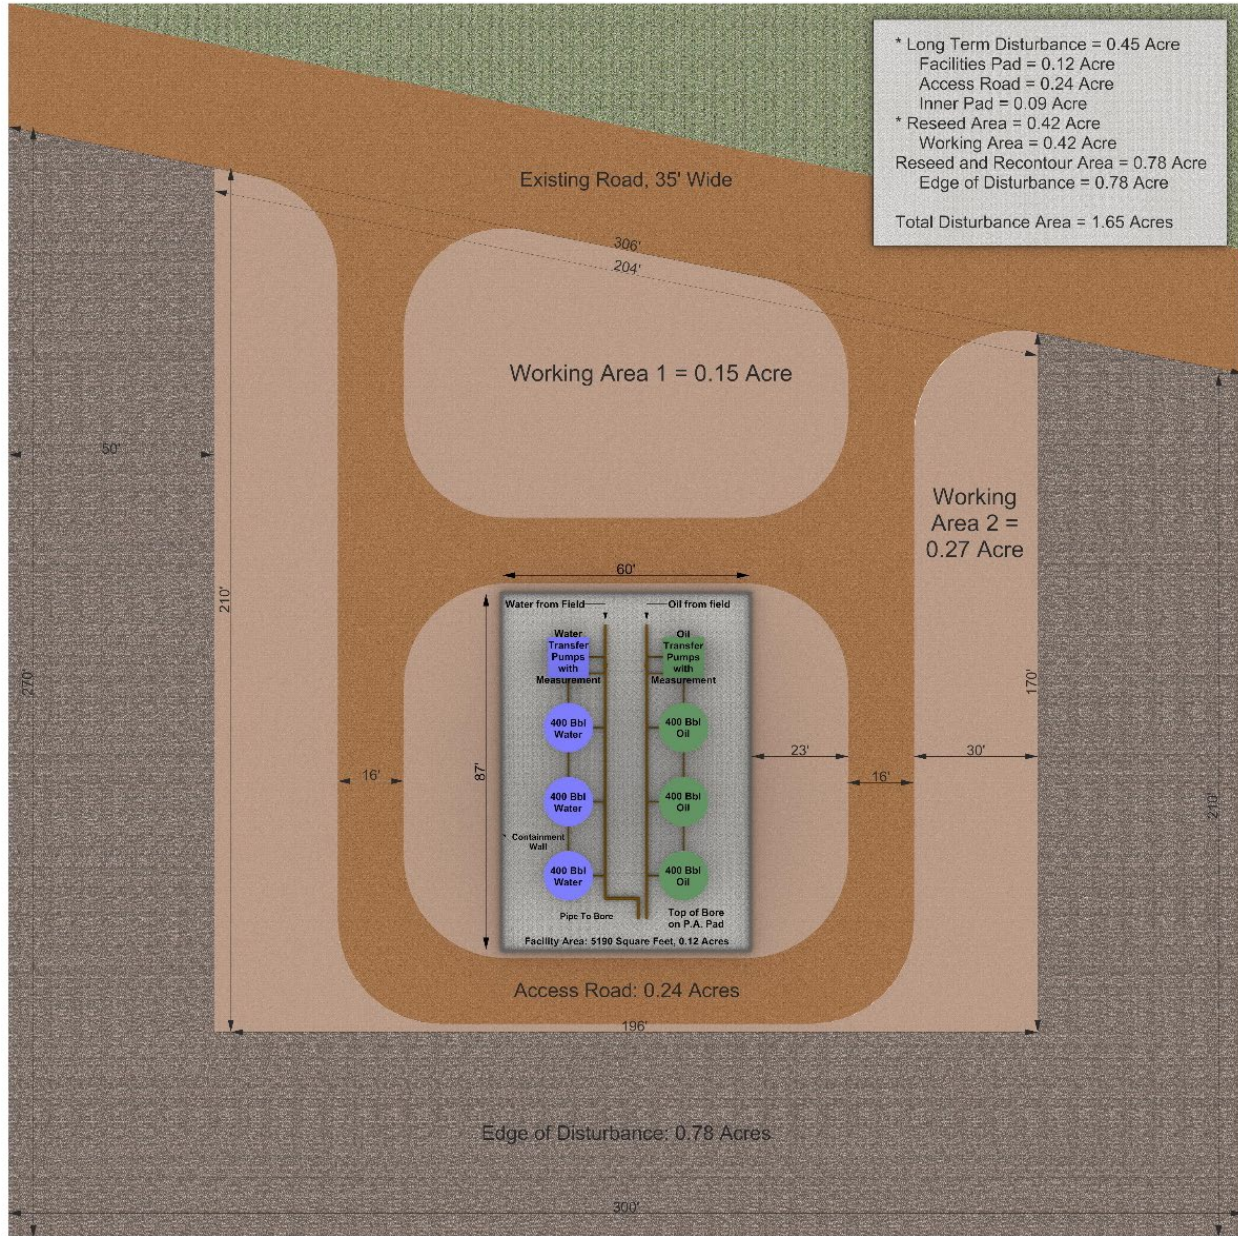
Preliminary Layout for Whiptail Transfer Facility
